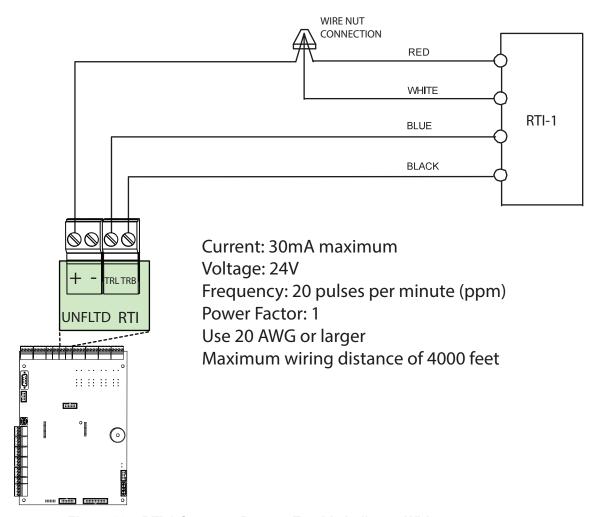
RTI-1 Common Remote Trouble Indicator Wiring
